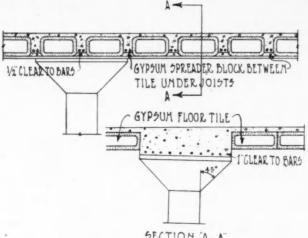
Cross-Section of Concrete Joist and Gypsum Tile Filler
